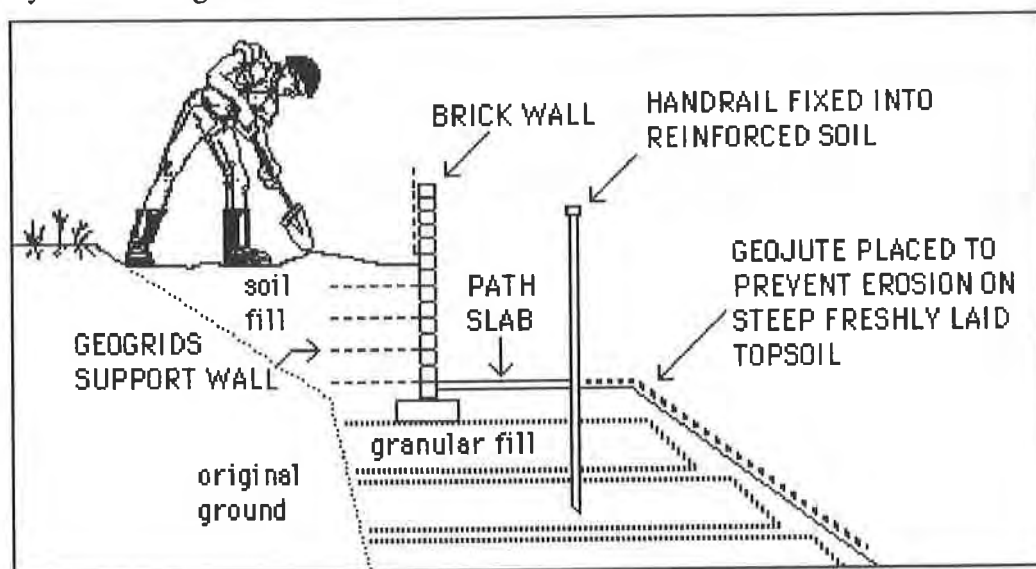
Cross-Sectional Diagram of Garden Wall Construction Using Geogrids.
